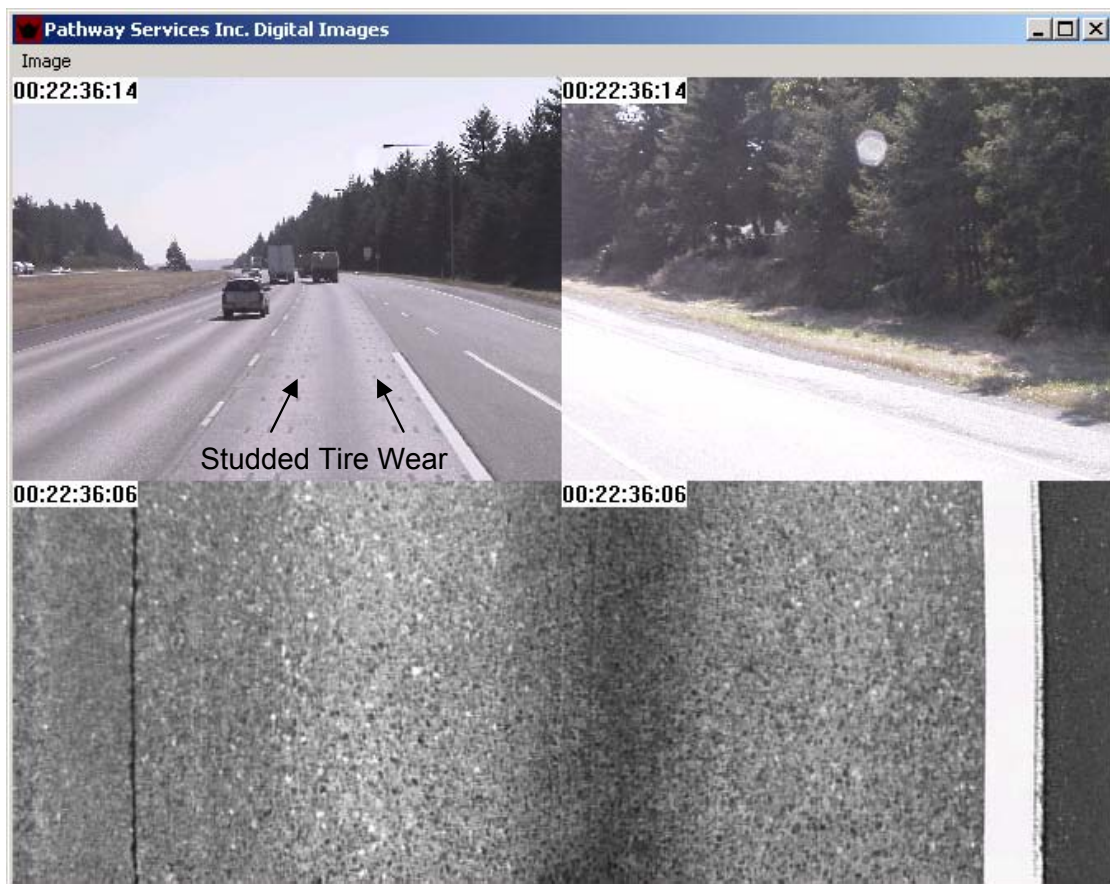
Pavement view in location of studded tire wear (I-5, northbound, milepost 112.23, Lacey vicinity, concrete pavement).
